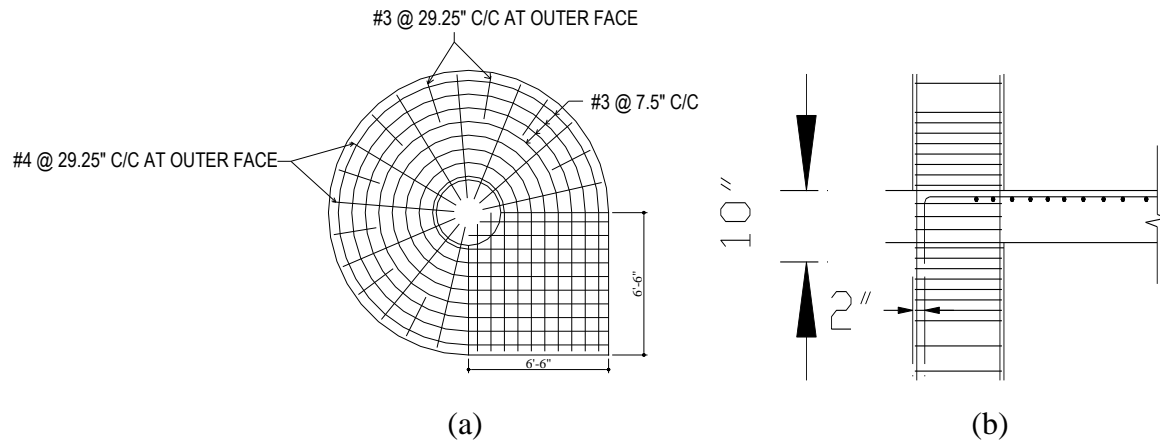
(a) Reinforcement details of stair at section C-C, (b) Magnified view of reinforcement details of column and stair.
